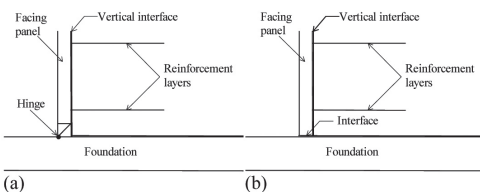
Conditions at the toe of the facing panel: (a) hinged; (b) free to slide.
